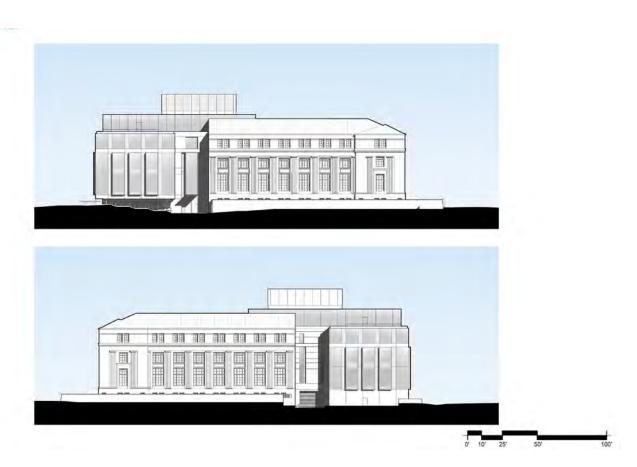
Alternative 2: East (top) and west (bottom) elevations of the FRB-East Building (proposed).
